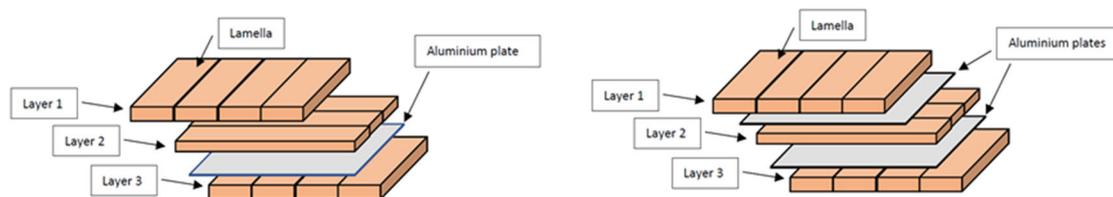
Constructed CLT plates reinforced with one (left)/two (right) aluminium plates.
